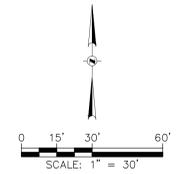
DETAILED SITE EVALUATION FOR PROPOSED FIRE STATION
